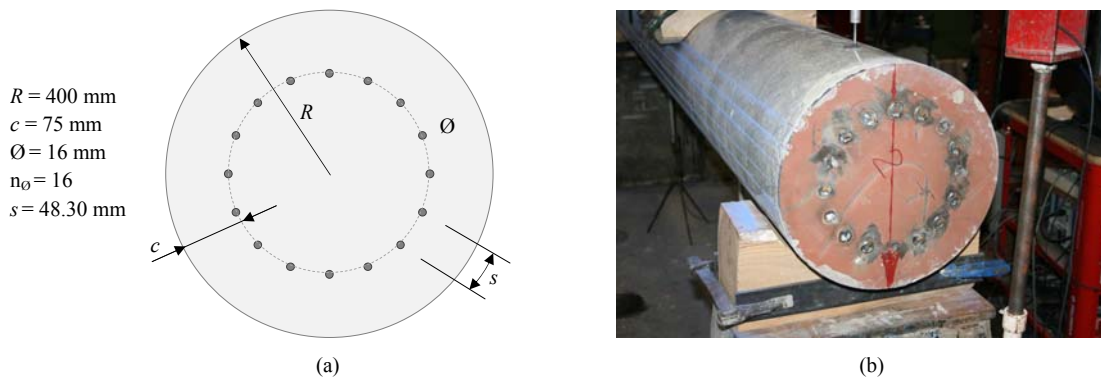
Symmetric cross section: (a) cross section configuration; (b) steel plate at the end of the element to anchor the reinforcement
